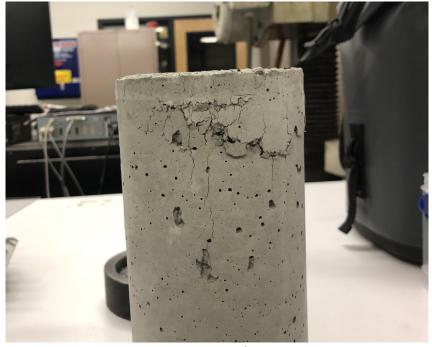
Mix Test Break Photo Credit: Hunter Kassens
